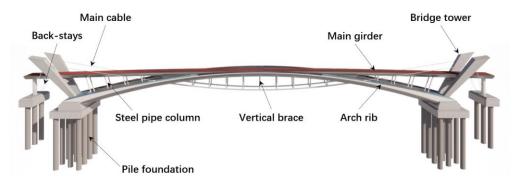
Structural Components of Yanluo Pedestrian Bridge
